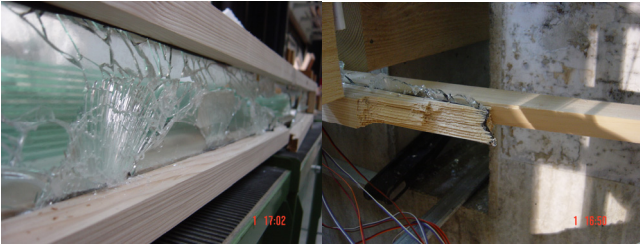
Reinforced girder after collapsing (left); failure of the reinforcing timber-slab (right)
